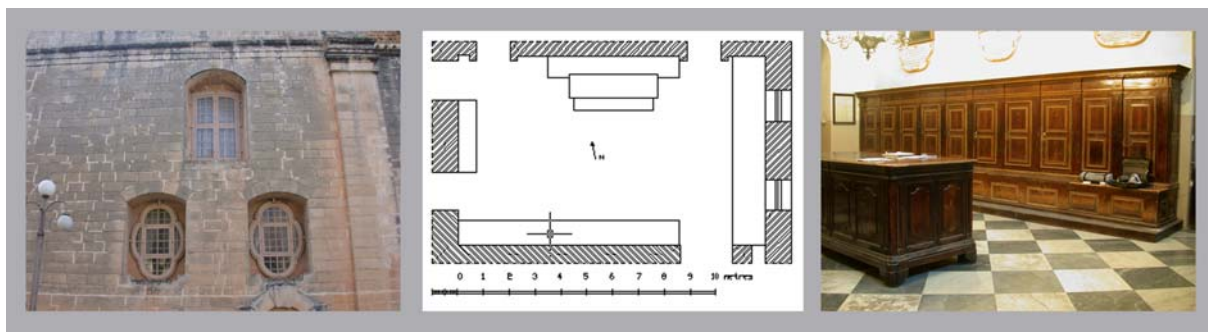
St Helen's Basilica, Birkirkara. Façade (left), plan (centre) and furniture (right) [2]
